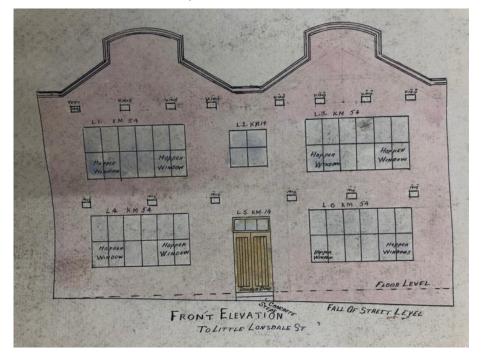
Original elevation drawings of the subject building in 1923 (Source: PROV VPRS 11200/1, item 754).
